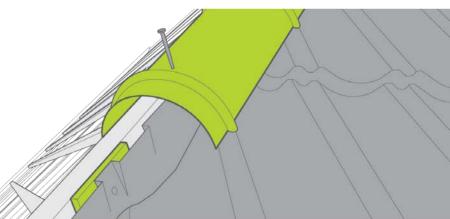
BEVELED RIDGE FLEXING. VENTILATION IMPROVEMENT ALTERNATIVE
